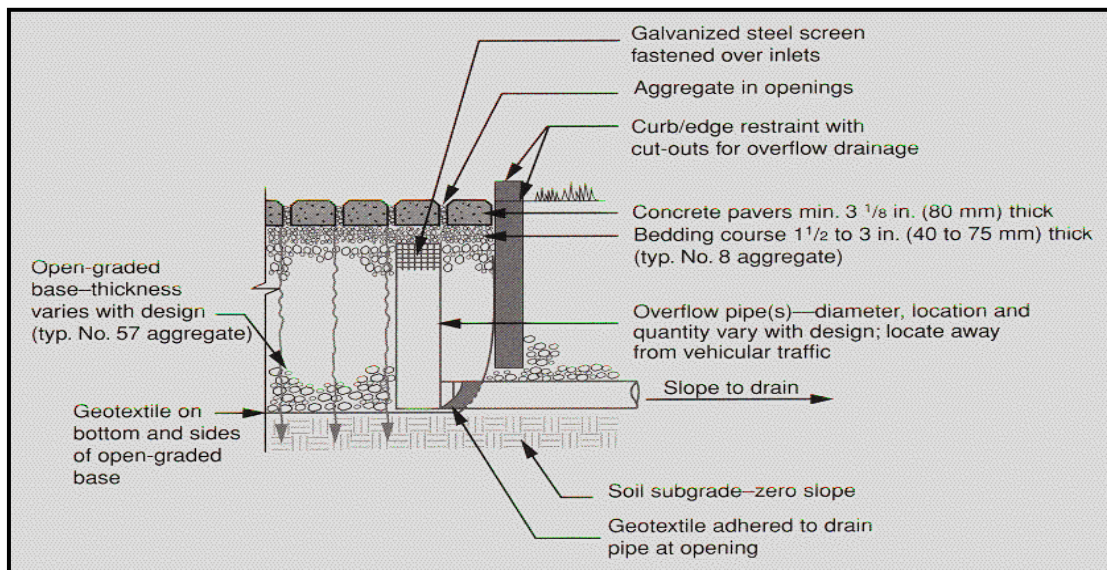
Figure III: Permeable Interlocking Concrete Pavement – Partial Exfiltration (Source: ICPI, 2000)
